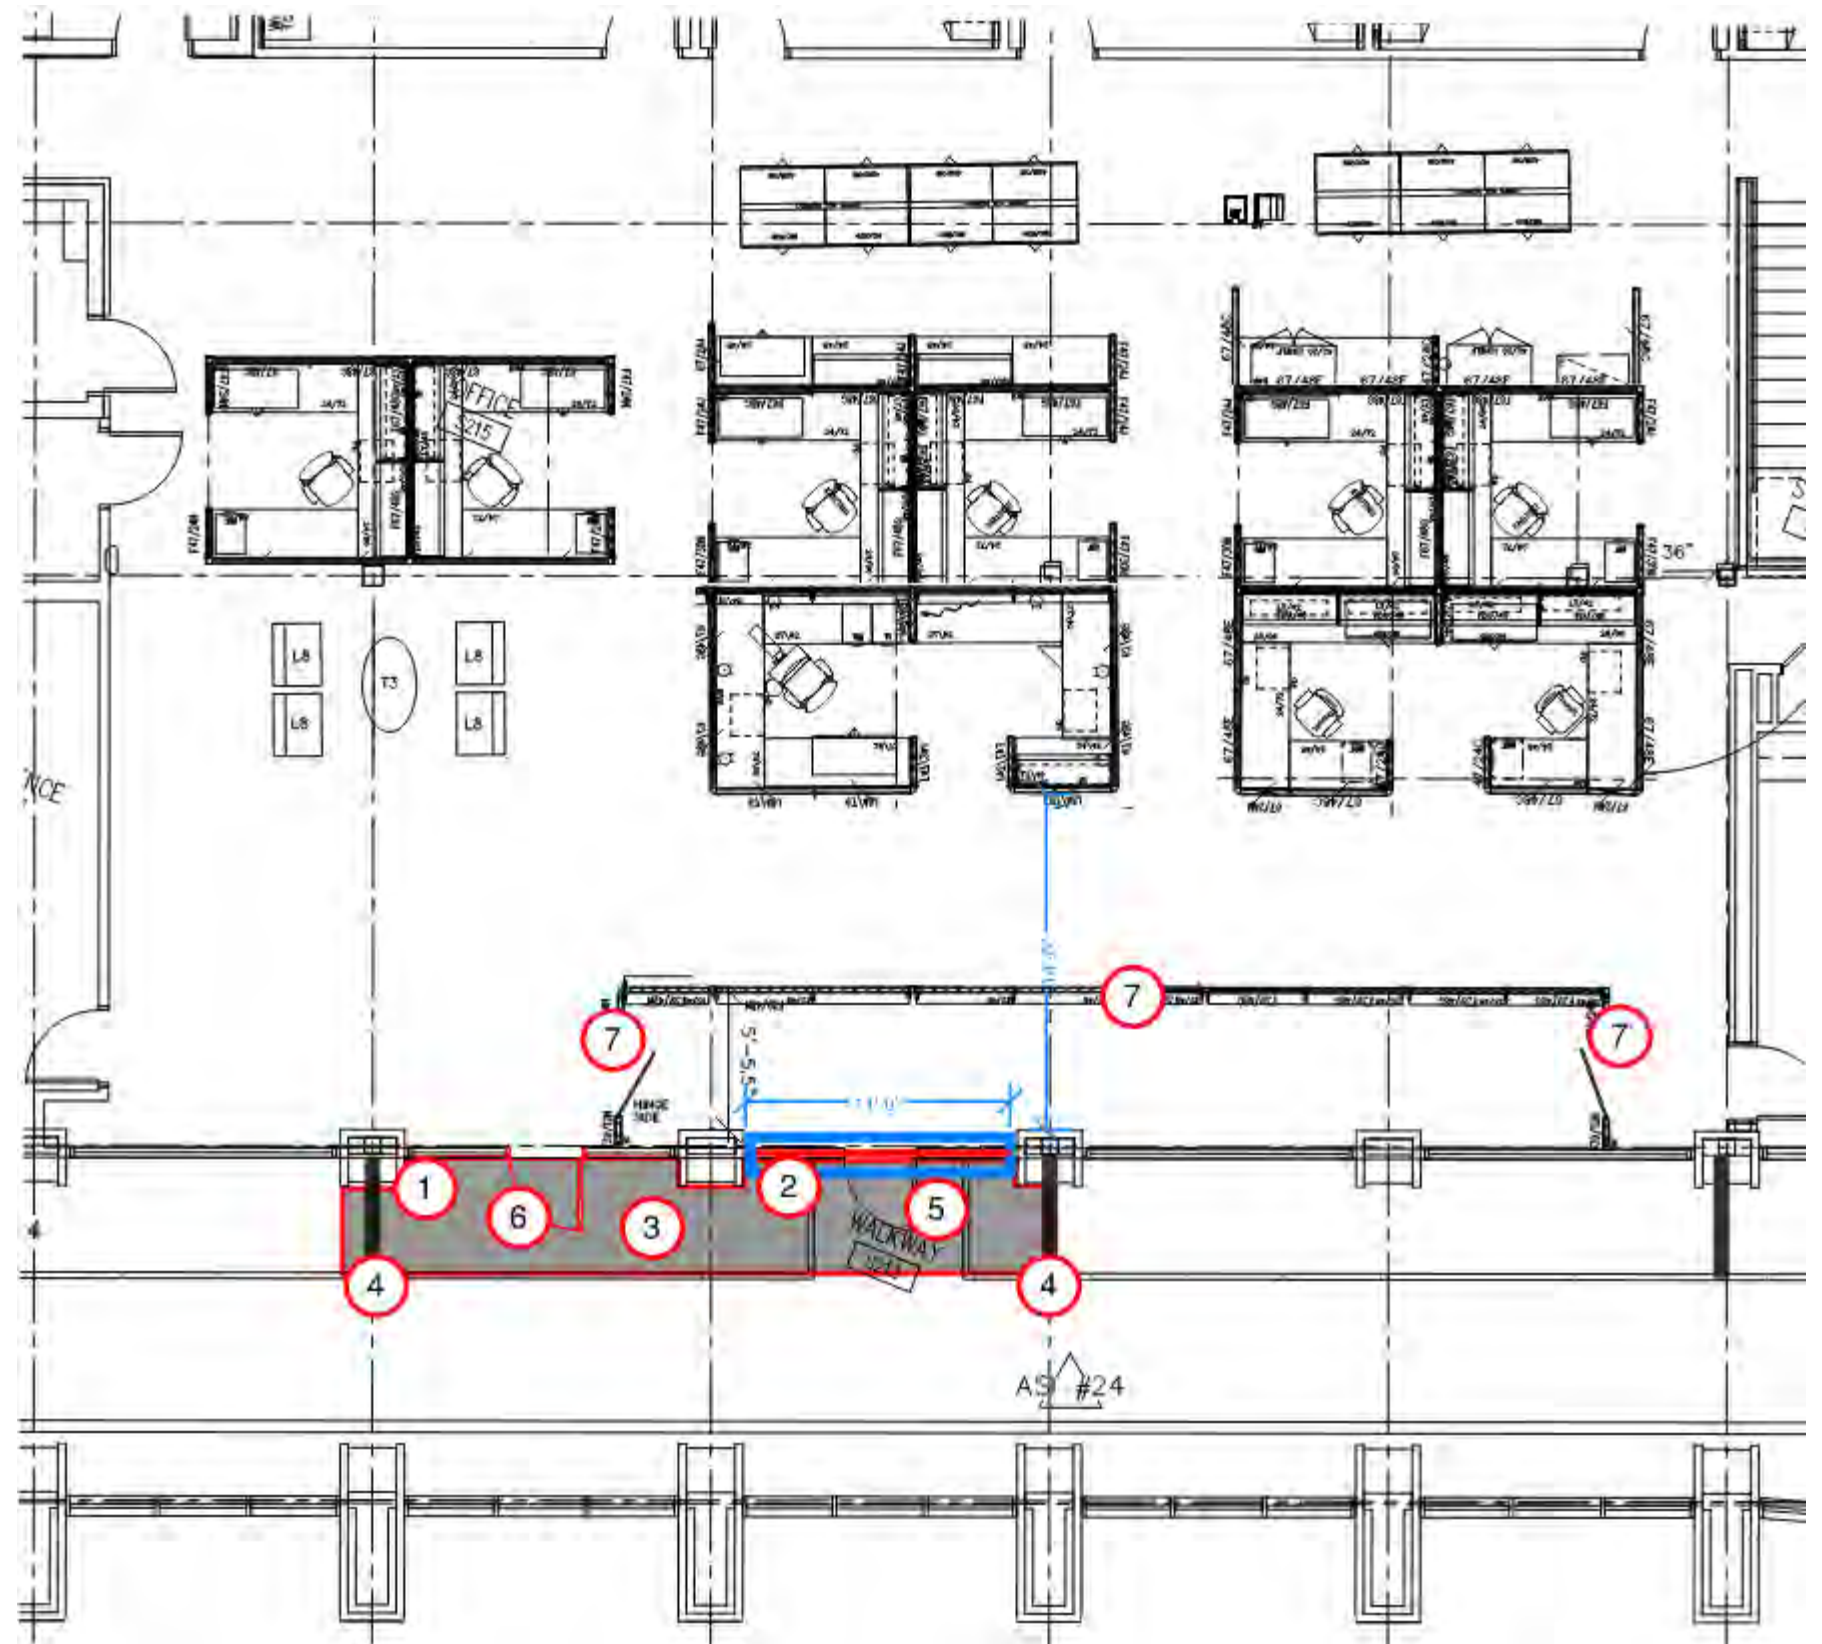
EXHIBIT E – LEVEL 2 RECEPTION WINDOWS (Engineering)
